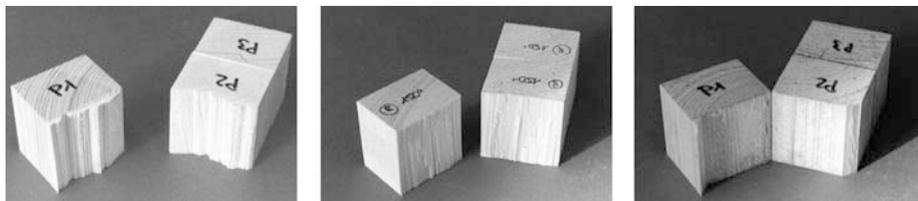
Typical failure modes: failure of timber outside the glue line at *left*, failure of the adhesion between adhesive and timber *centre* and failure of the cohesion of the adhesive *right
